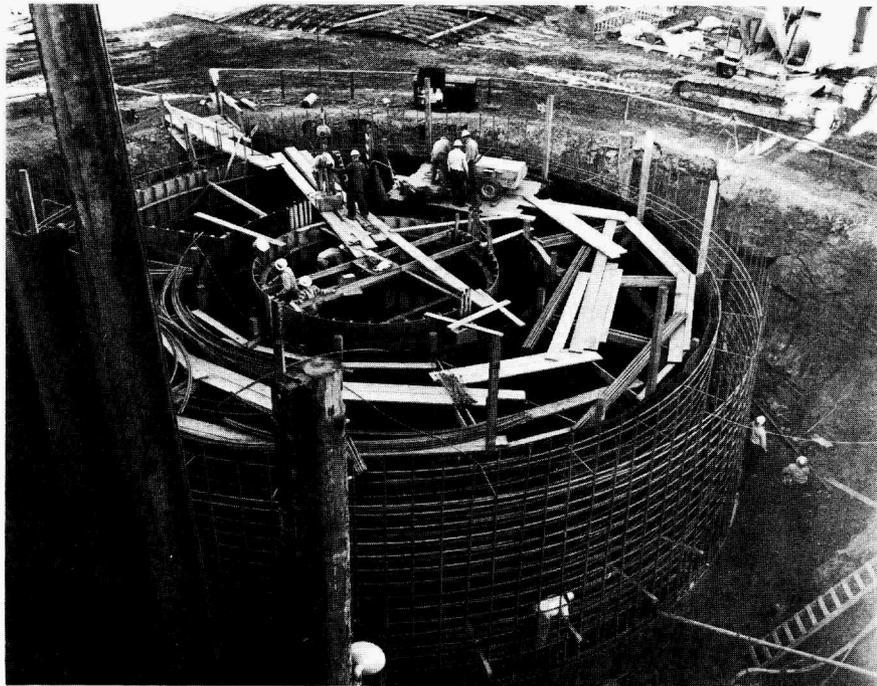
Liners and Reinforcing Steel for Lower Lift at Humboldt Bay Site.
